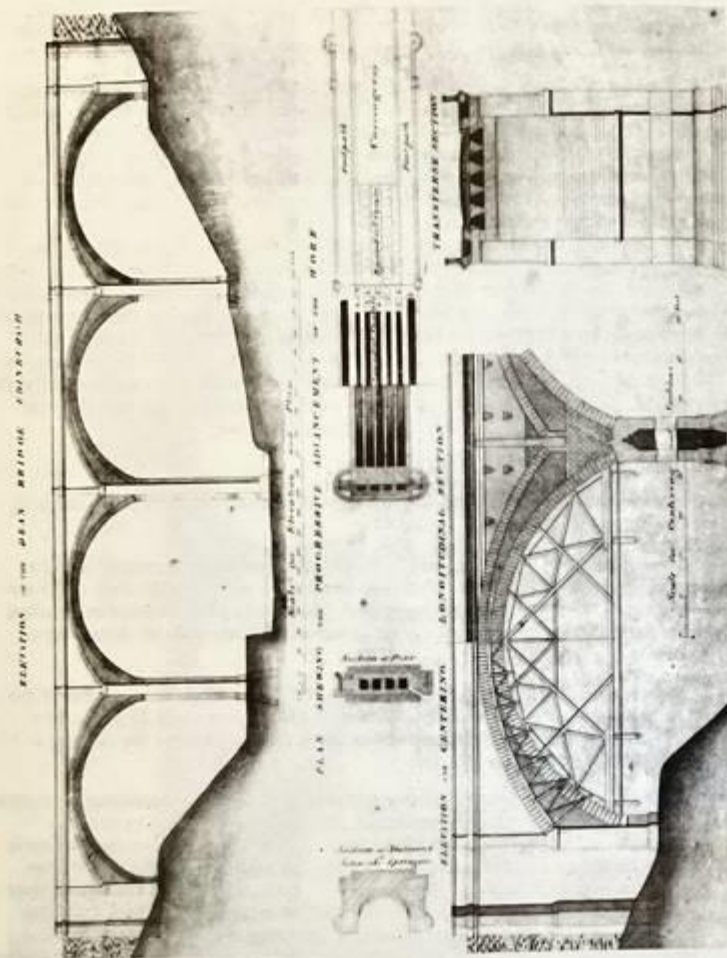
Dean Bridge as built. Drawing by the Resident Engineer, Charles Atherton in April 1833.<sup>9</sup> Note the hollow piers and spandrels.
